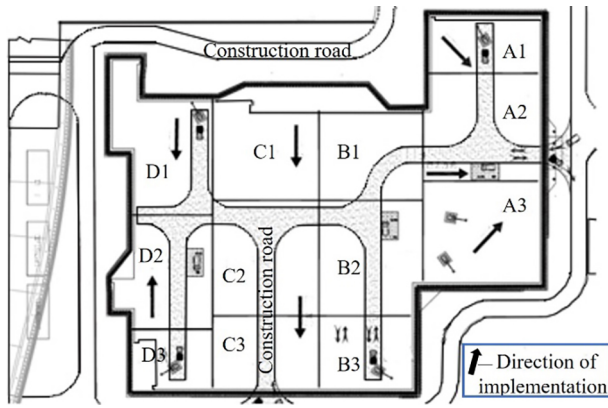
The schematic diagram of foundation pit zoning layout and construction direction
